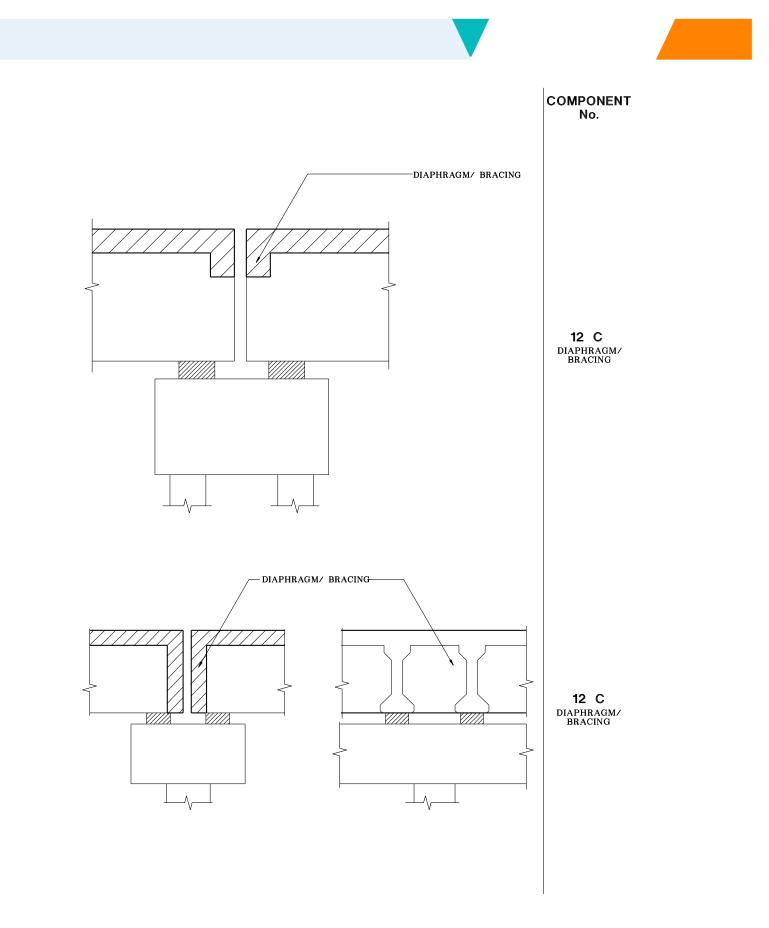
LOAD BEARING DIAPHRAGMS & DIAPHRAGM/ BRACING (Sheet 2 of 2)
